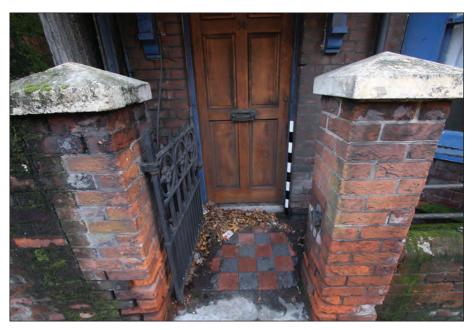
Front gates and entrance to 14 Chesil Street (2009)
